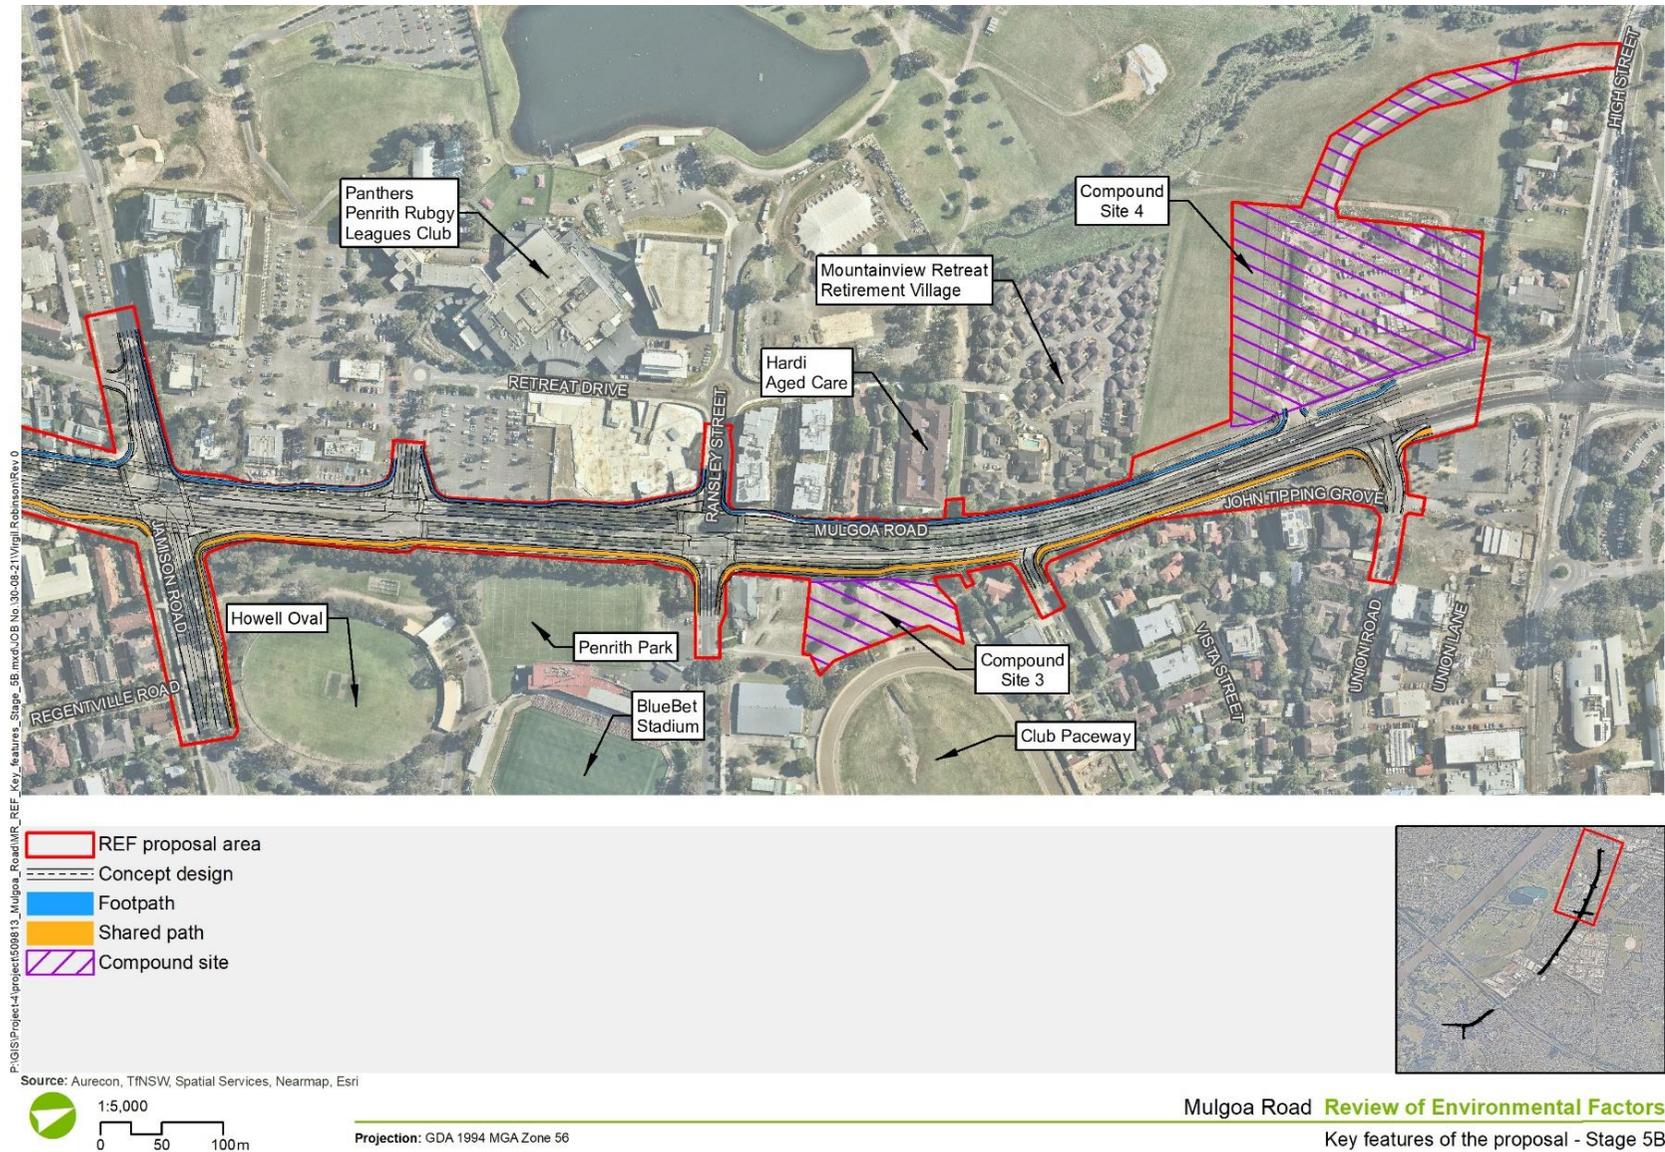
Key features of the proposal between Jamison Road and Union Road
